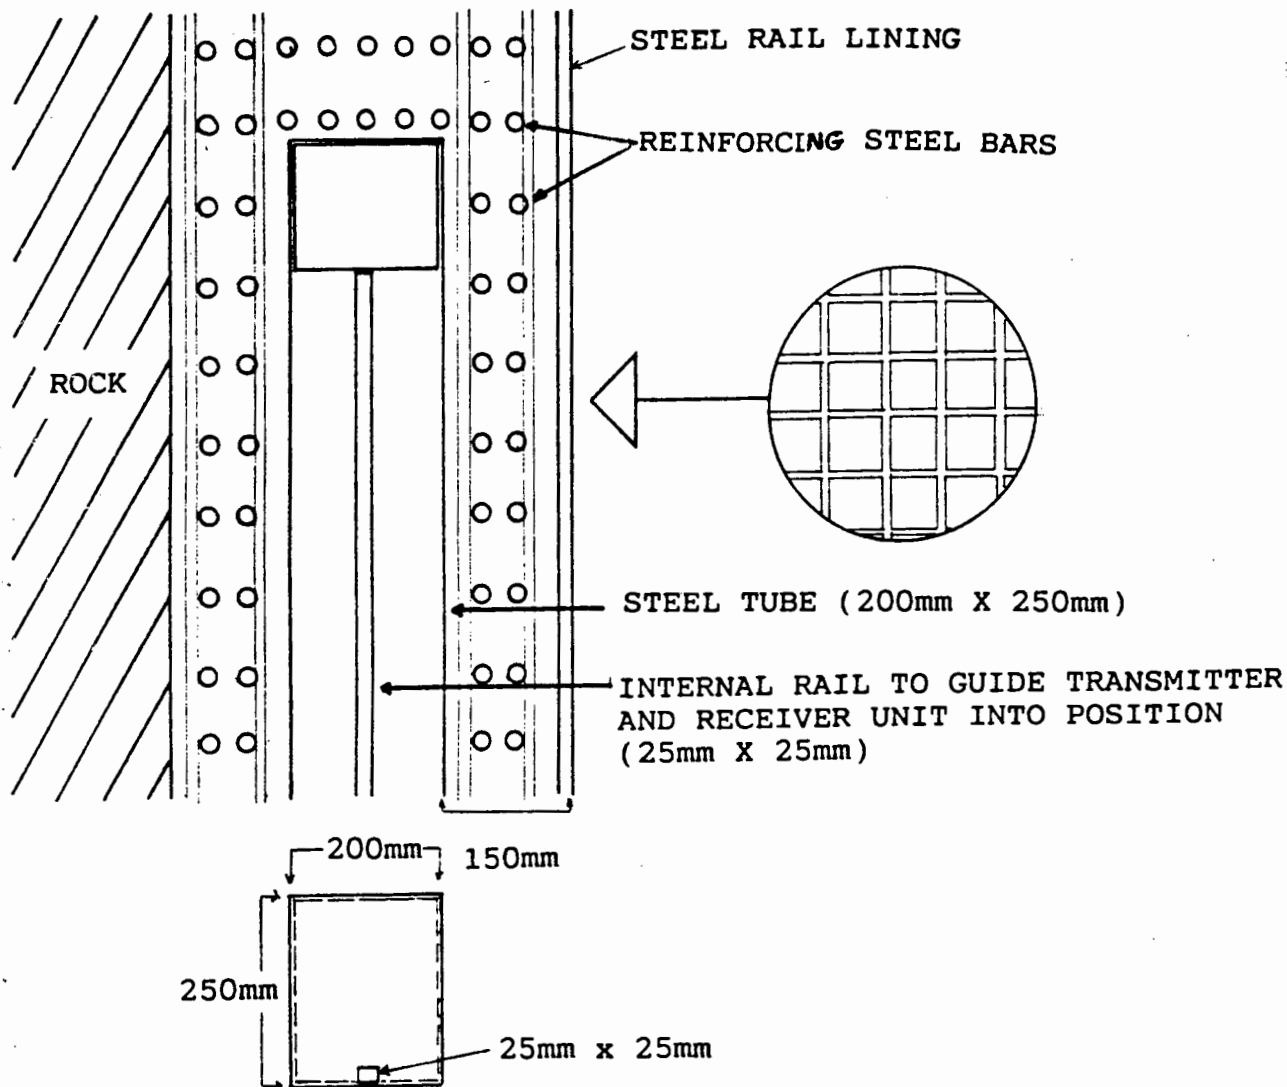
DETAILED LAYOUT OF SHAFT WALL
